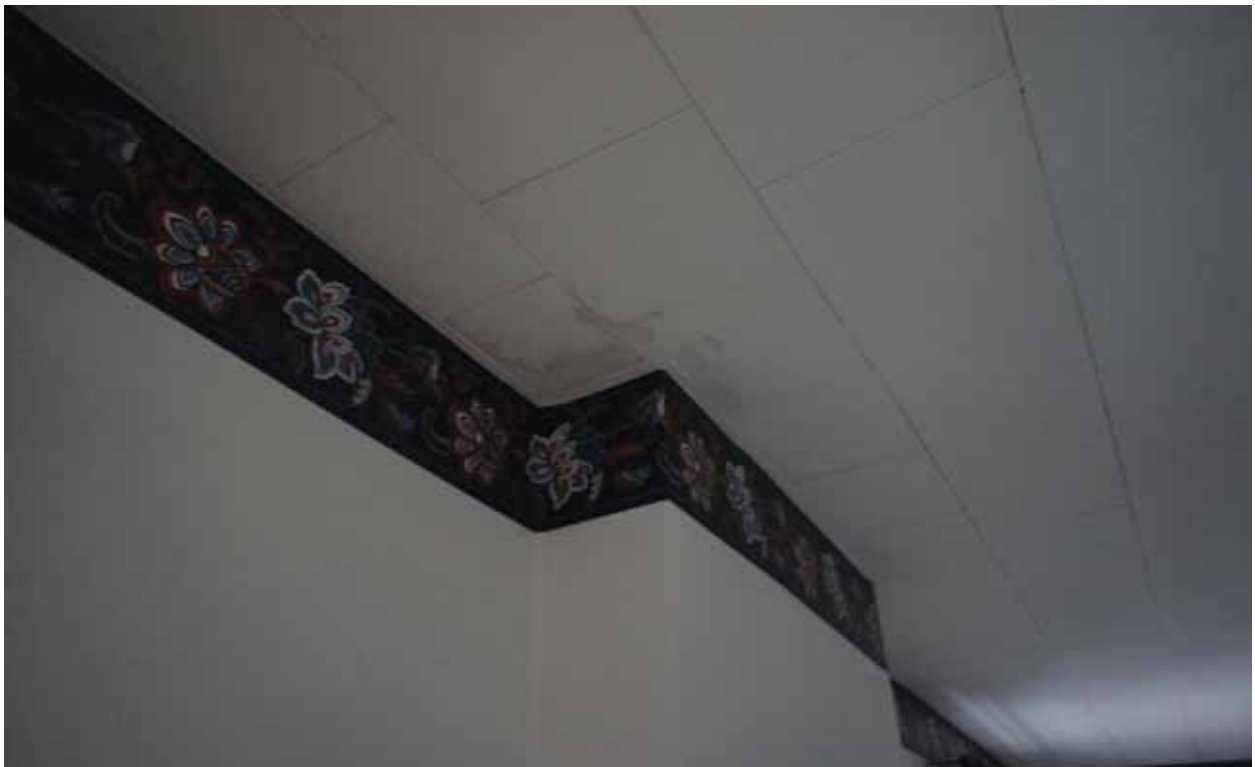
Water damage permeates through the original plaster and on to the asbestos faux ceiling.
